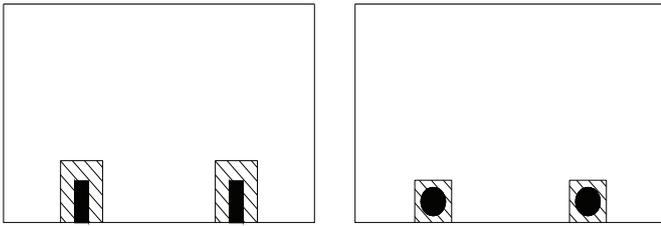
Near surface mounted FRP, rectangular shapes and rods
